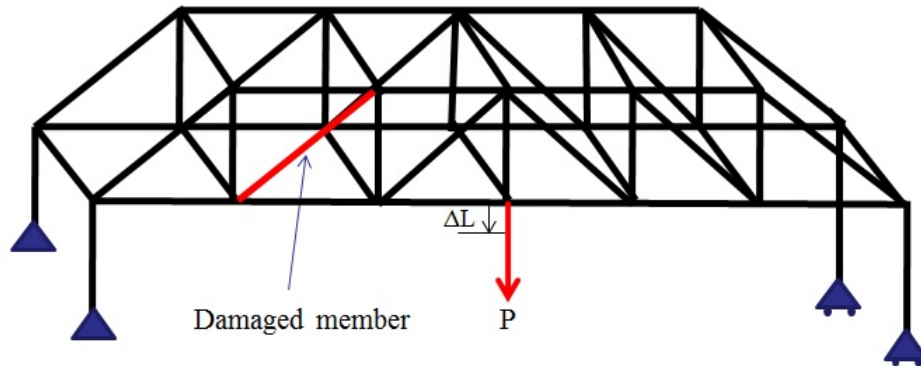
Schematic of loaded damaged numerical truss bridge model
